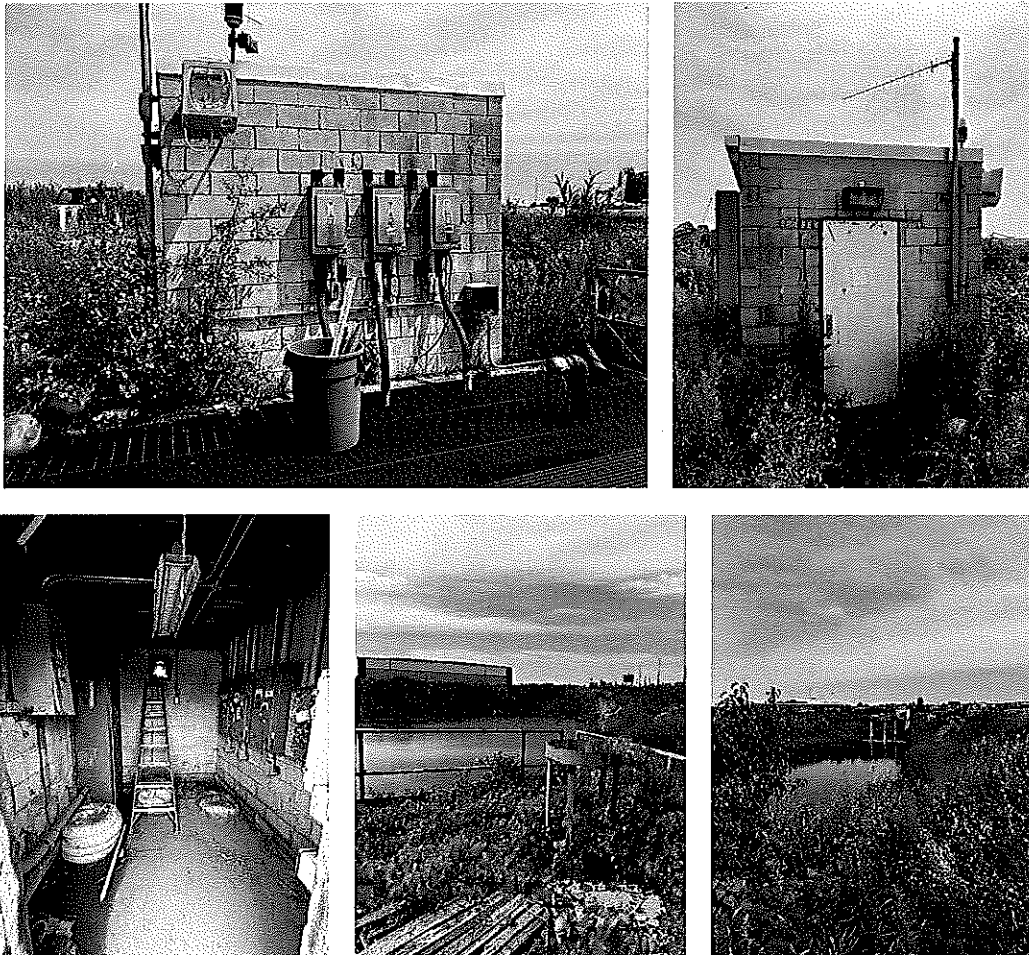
Pump house remains unmaintained with non-working electrical and lighting utilities, and significant vegetative overgrowth; attached detention pond with standing water. McBride Dale Clarion site evaluation photos. Photos Captured: 24 July 2026.
